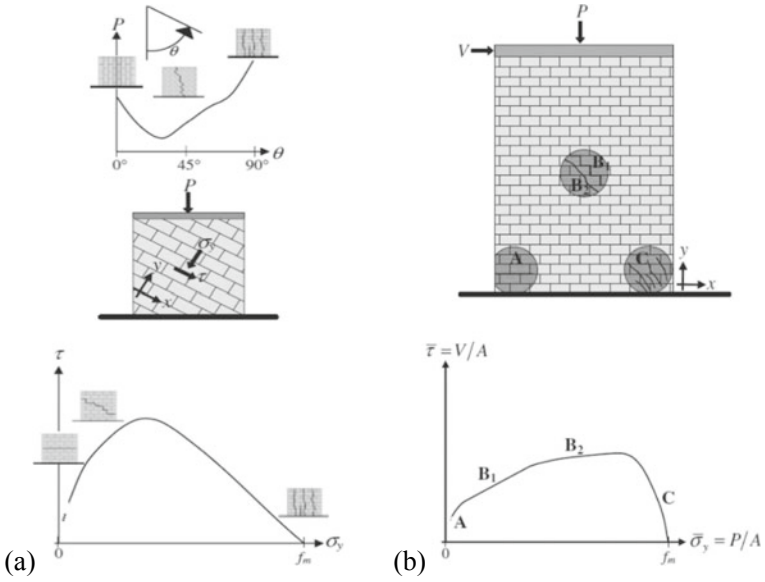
Maximum strength and failure modes of masonry a at material scale, b at structural element (pier) scale [14]
